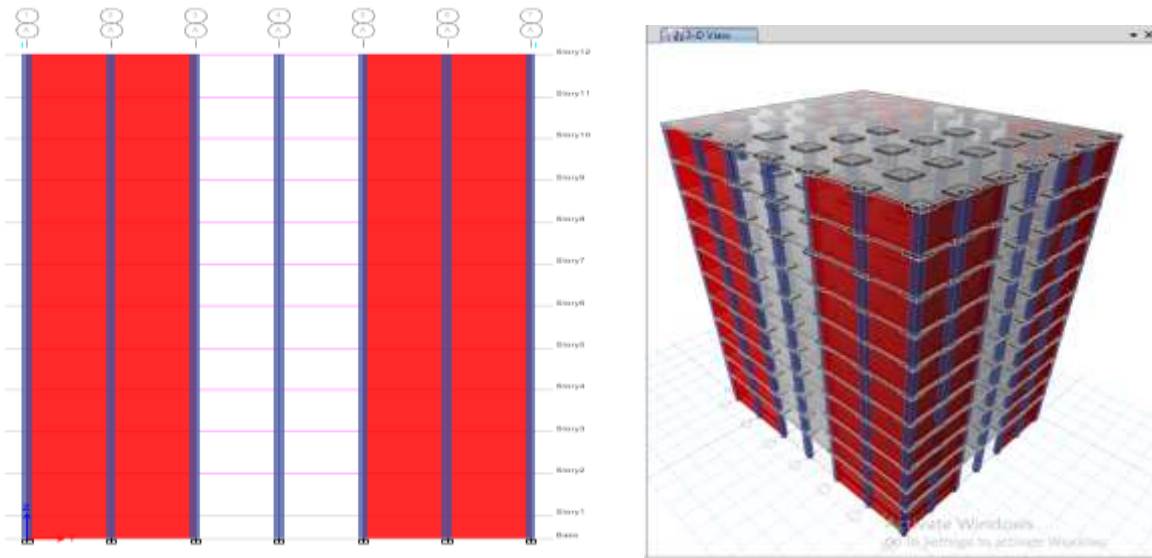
Elevation and 3D view OF L Shaped Shear wall
